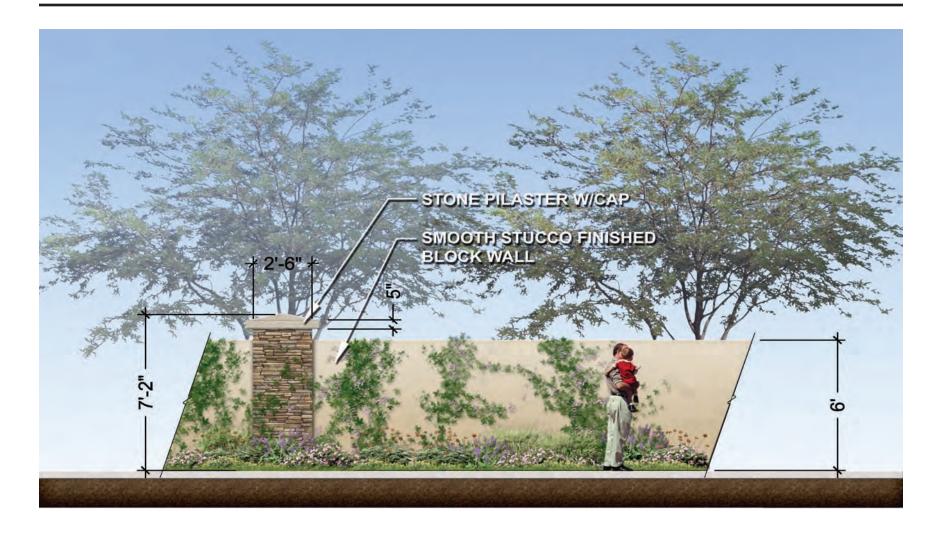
| Stucco Finished Wall With Stone Pilasters
